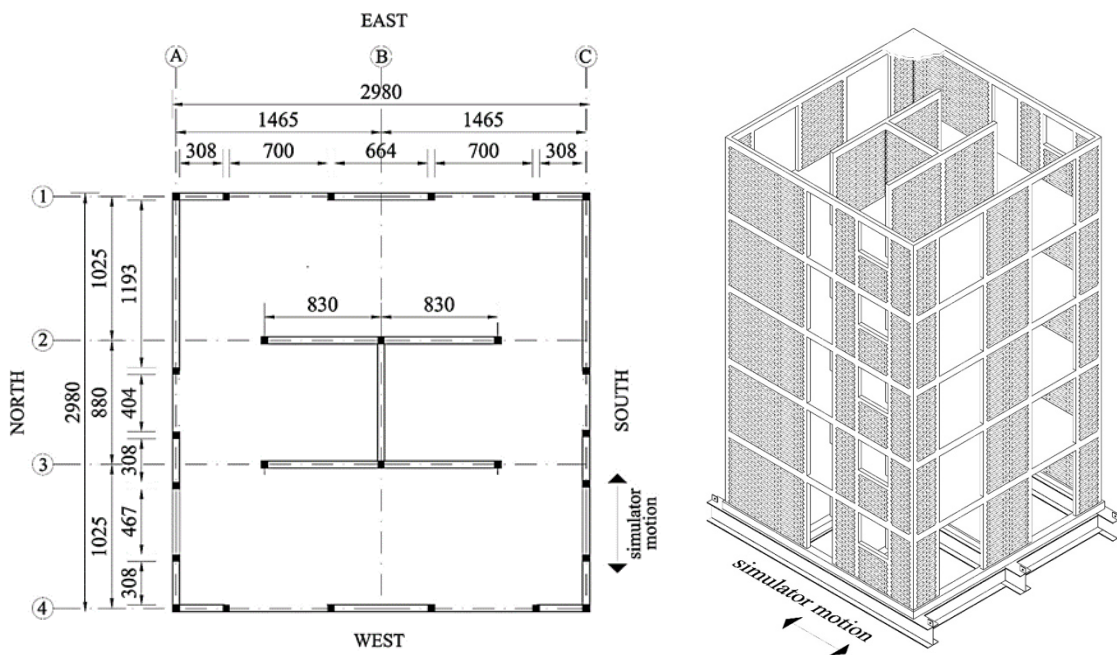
Model plan and 3D view of specimen M5 (units in mm)
